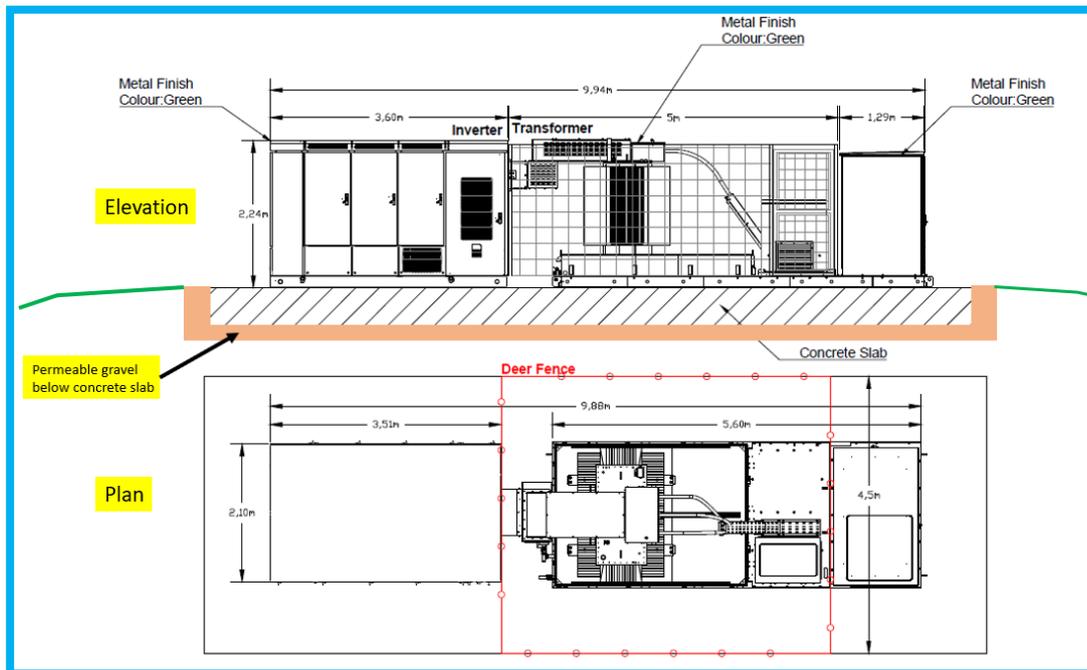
Section and plan of substation with permeable gravel underlayer extending over the full area of the compound.
